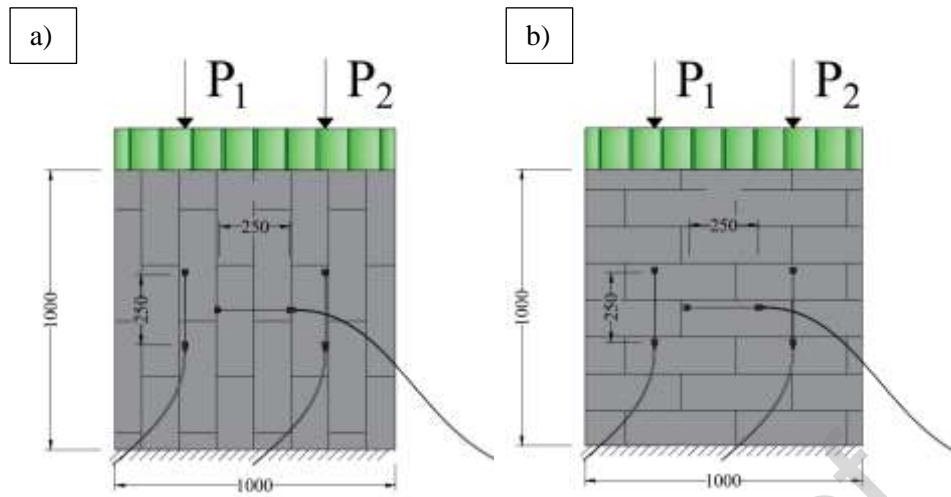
Load pattern for axial compression test on walls and LVDT's arrangement for a) W-ER-sideA and b) W-ER-sideB (dimensions in mm).
